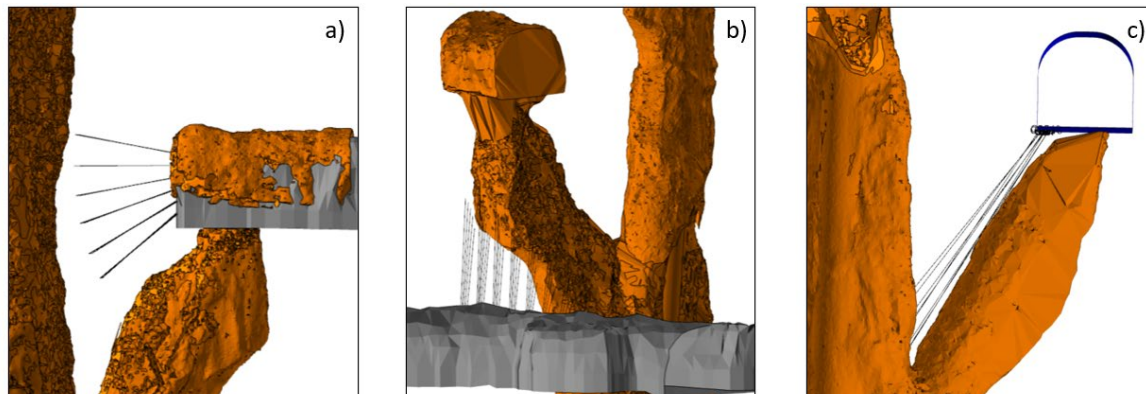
Example of cablebolting applications at Carrapateena. (a) Thin pillar support; b) Uphole cables below finger passes; c) 'Umbrella' cables above finger pass hanging wall
